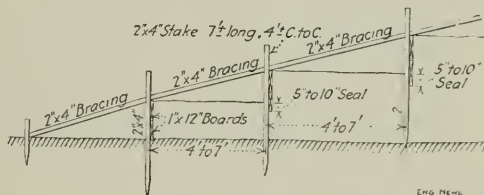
SHEERBOARD METHOD OF RETAINING MATERIAL
